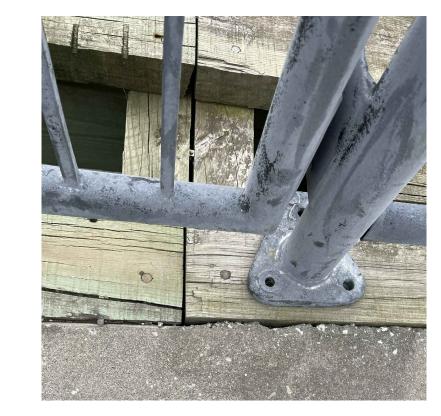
ENTRANCE TAMP SOUTH THREE BOLT MISSED IN TWO COLUMN BASE PLATES
